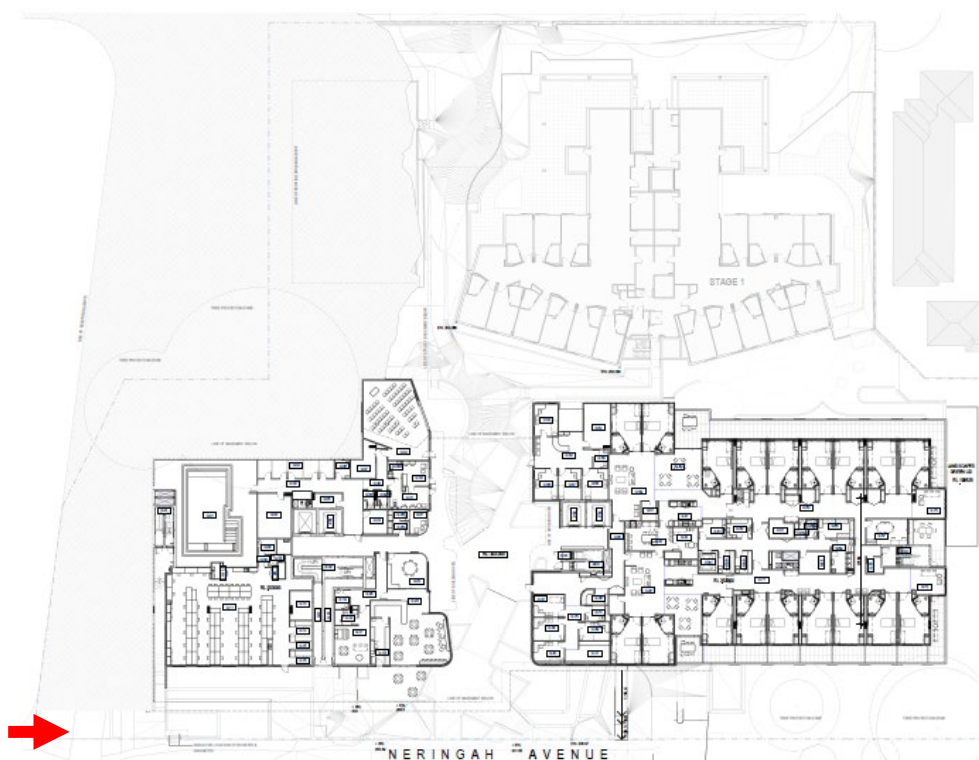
Proposed ground floor plan. (Source: Bickerton Masters Architects)
